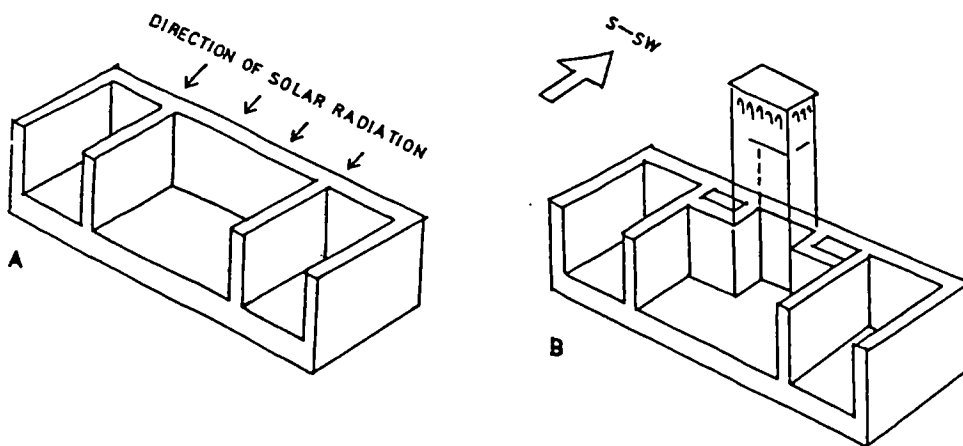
Sketch to illustrate the importance of the structure of the badgir walls in insulating the rear south facing wall of the summer room. A) unprotected rear wall of non-badgir house and B) shows the rubble filled battress walls that reduce the penetration of heat from the outer face of the wall.
